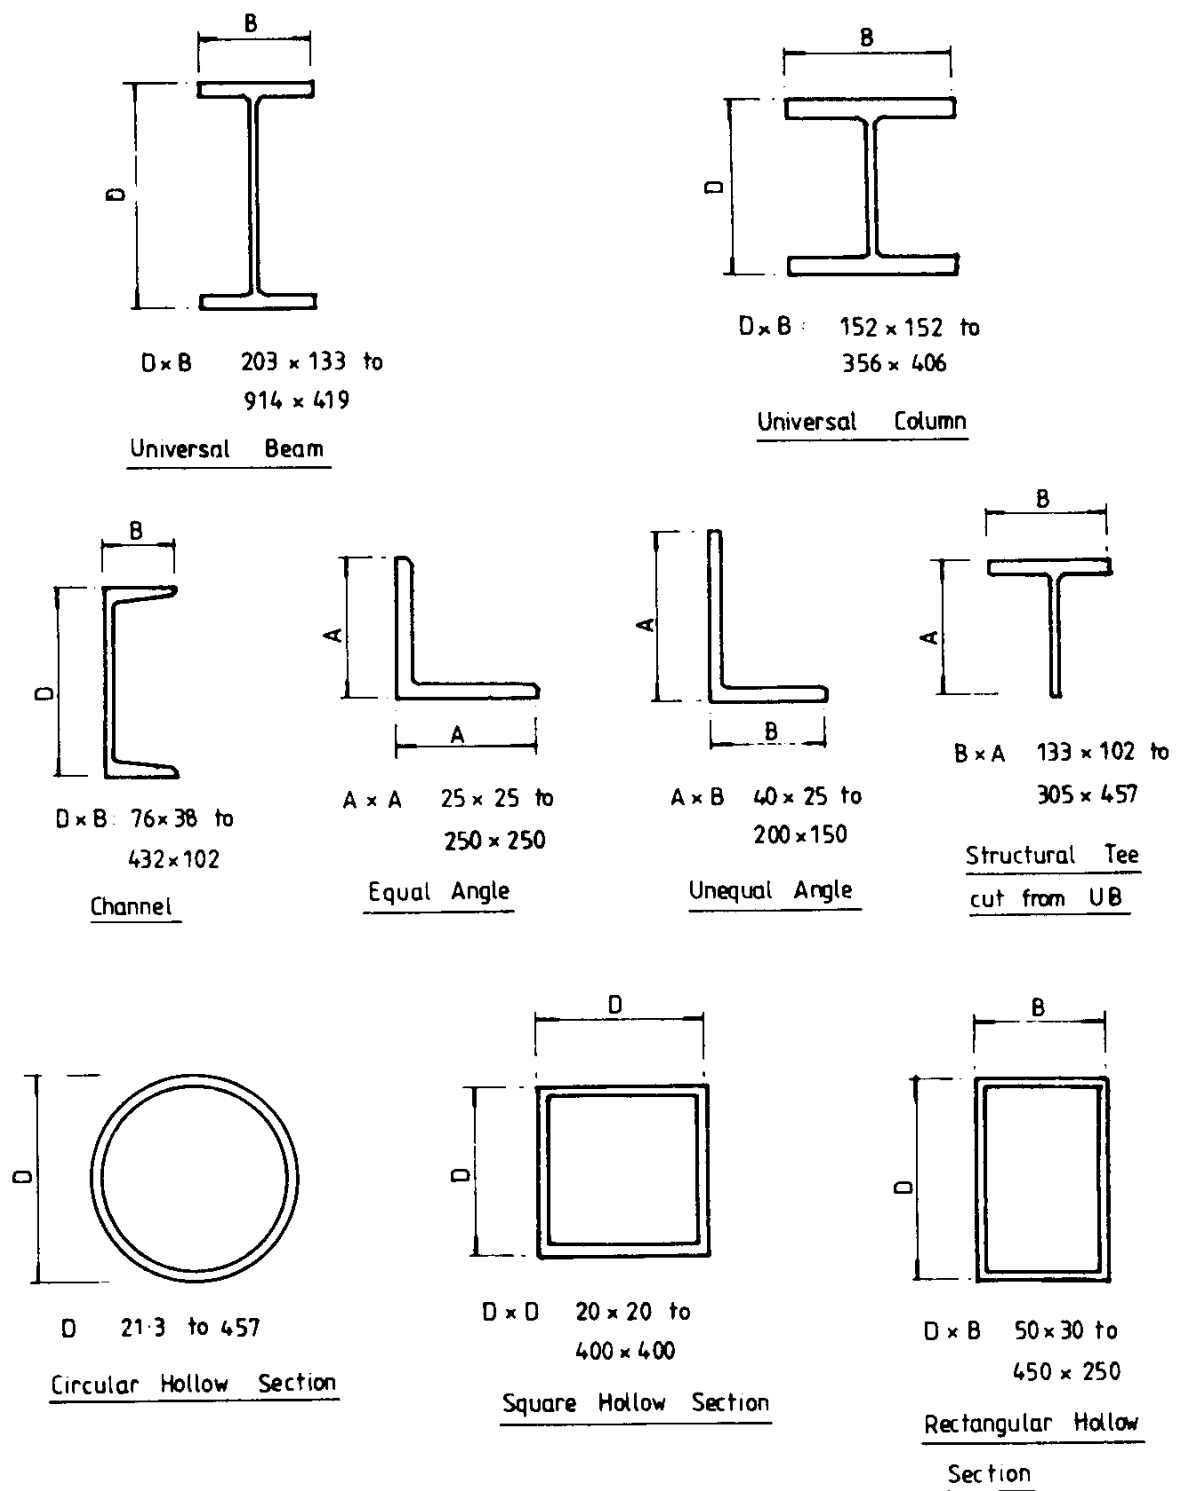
Hot Rolled Steel Sections (extracted from ref. 6)
